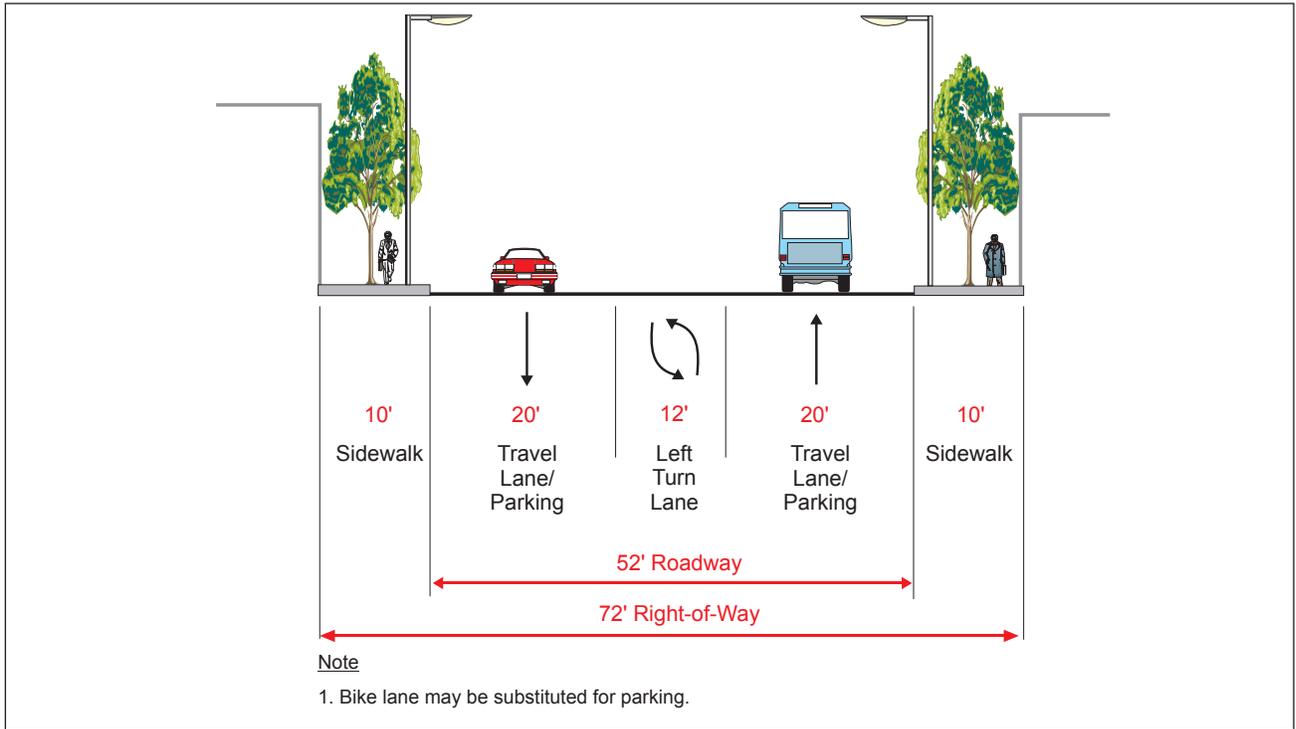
Street Standard Section for Street (Collector) - 2 Lane
